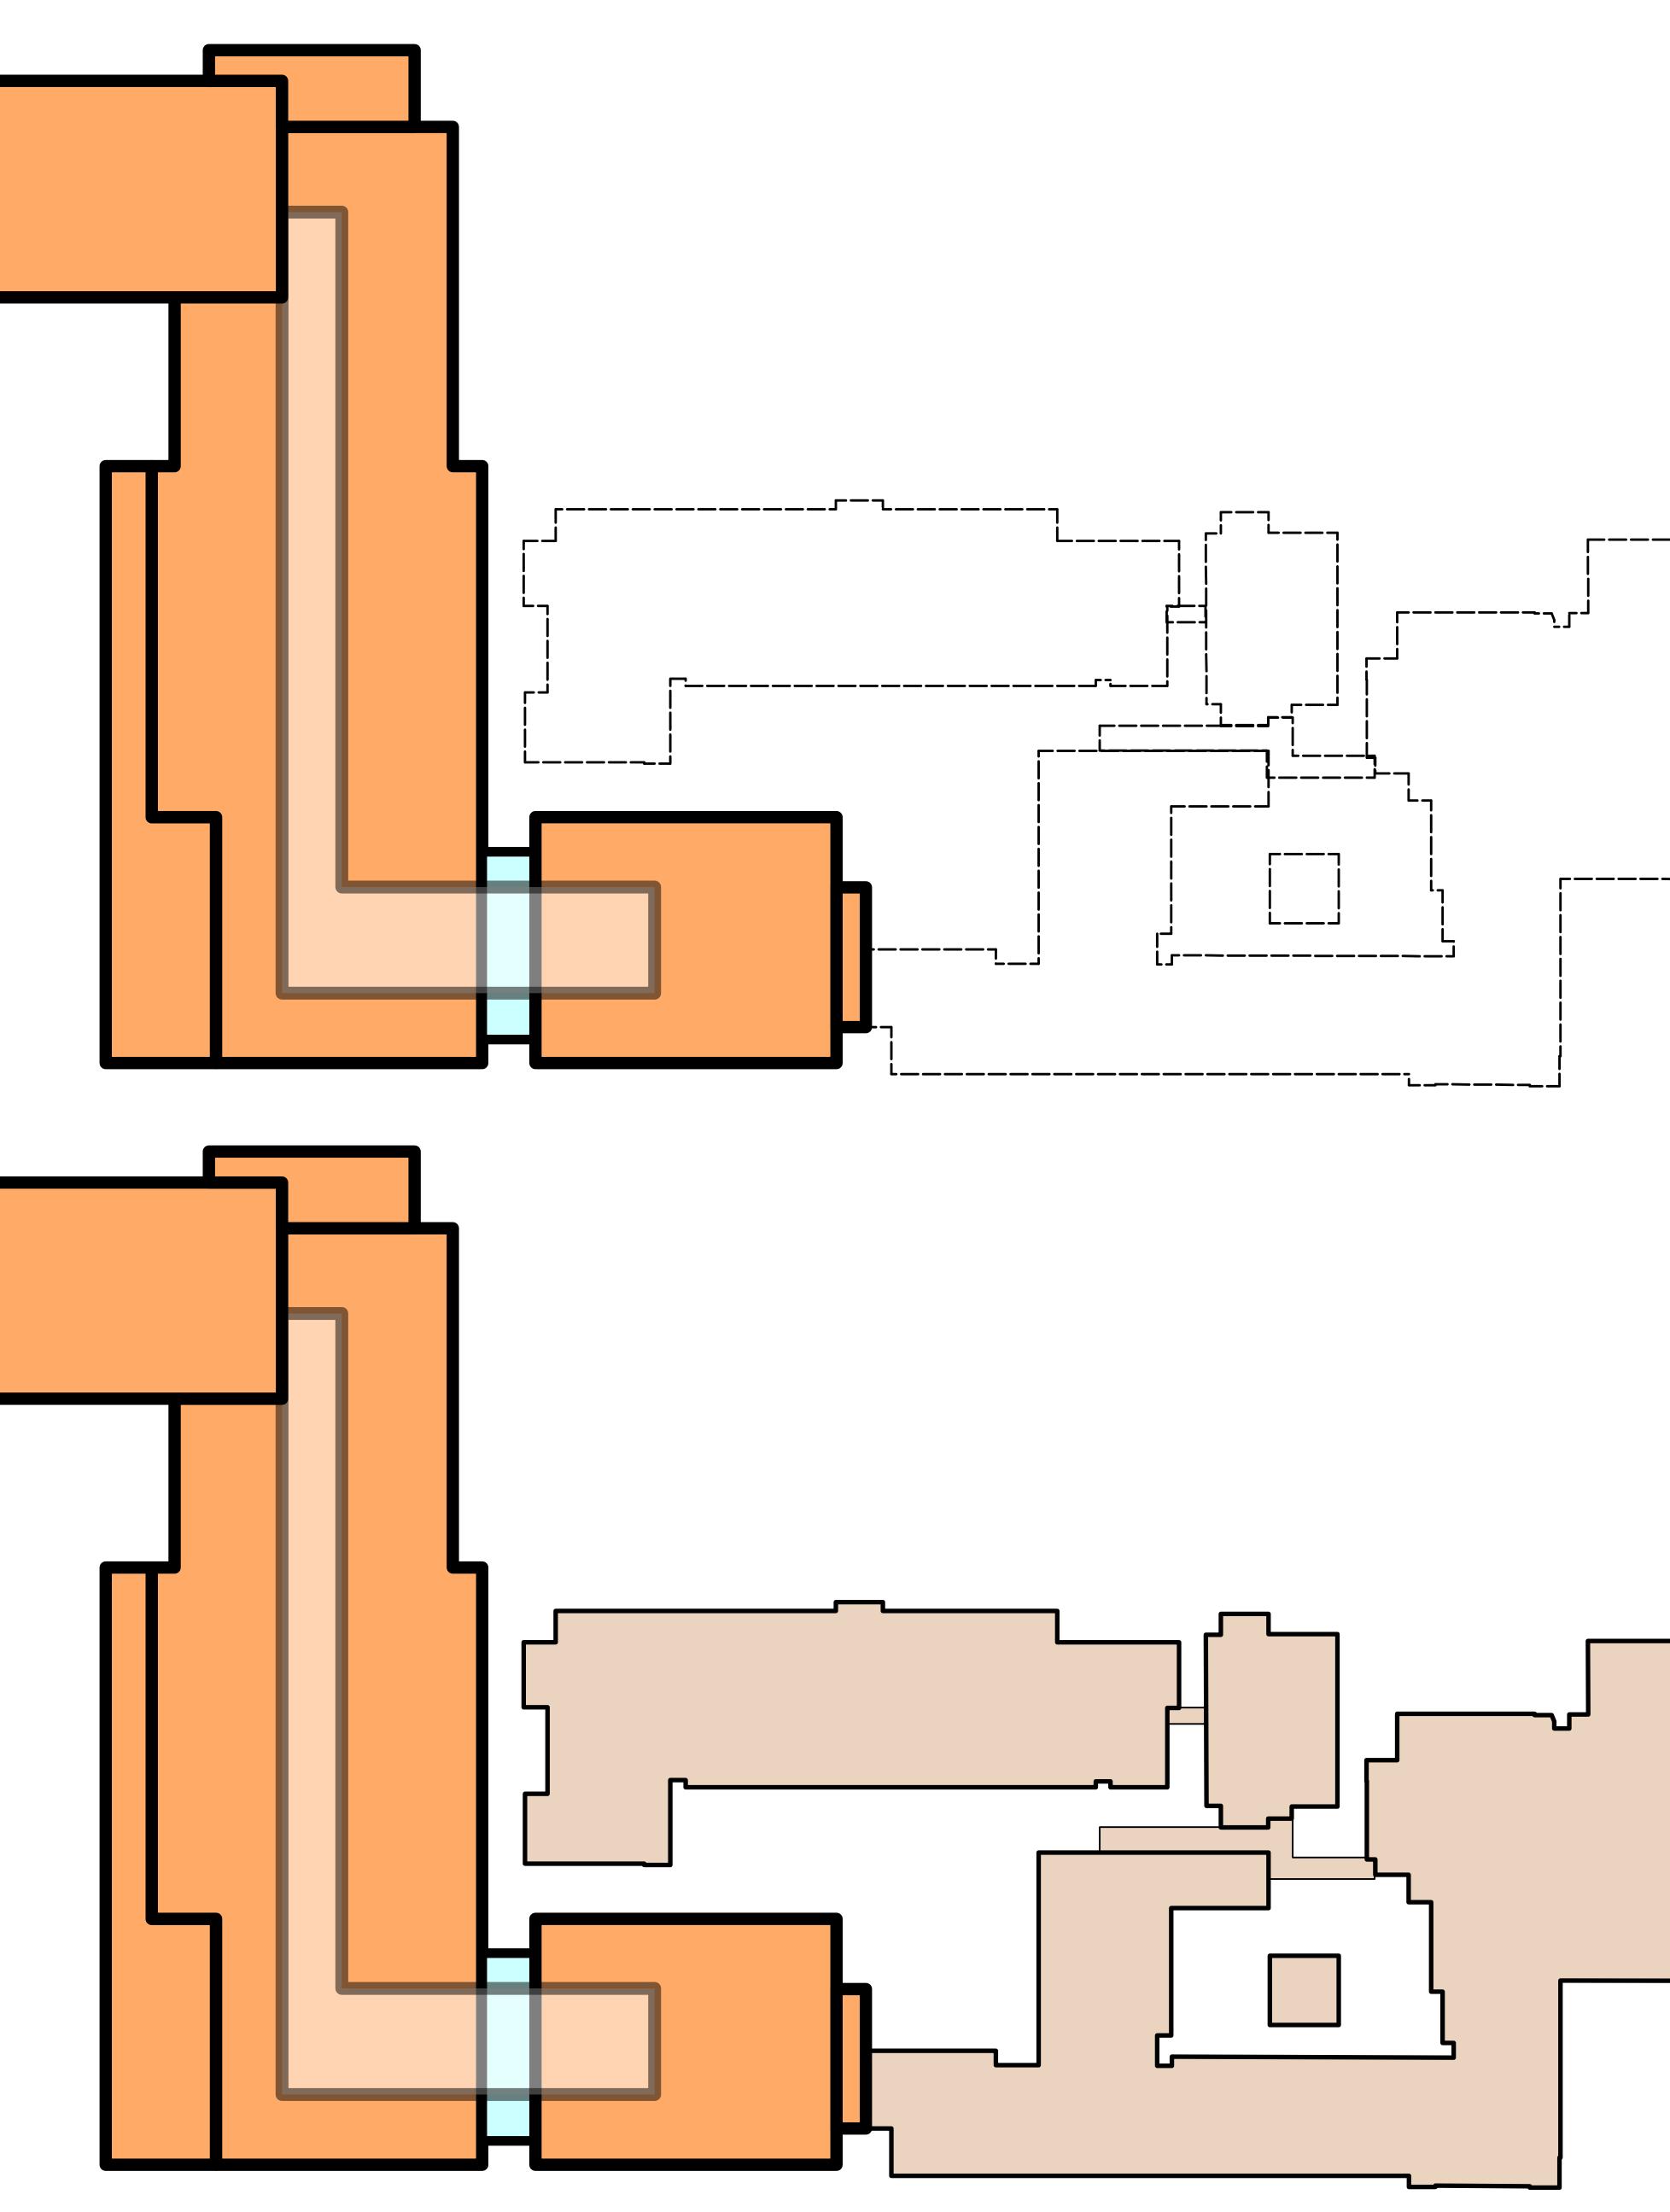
Site Development Plan - OPTION 4A PRELIMINARY SD68 NDSS SITE CORNERSTONE architecture & planning group May 30.14
